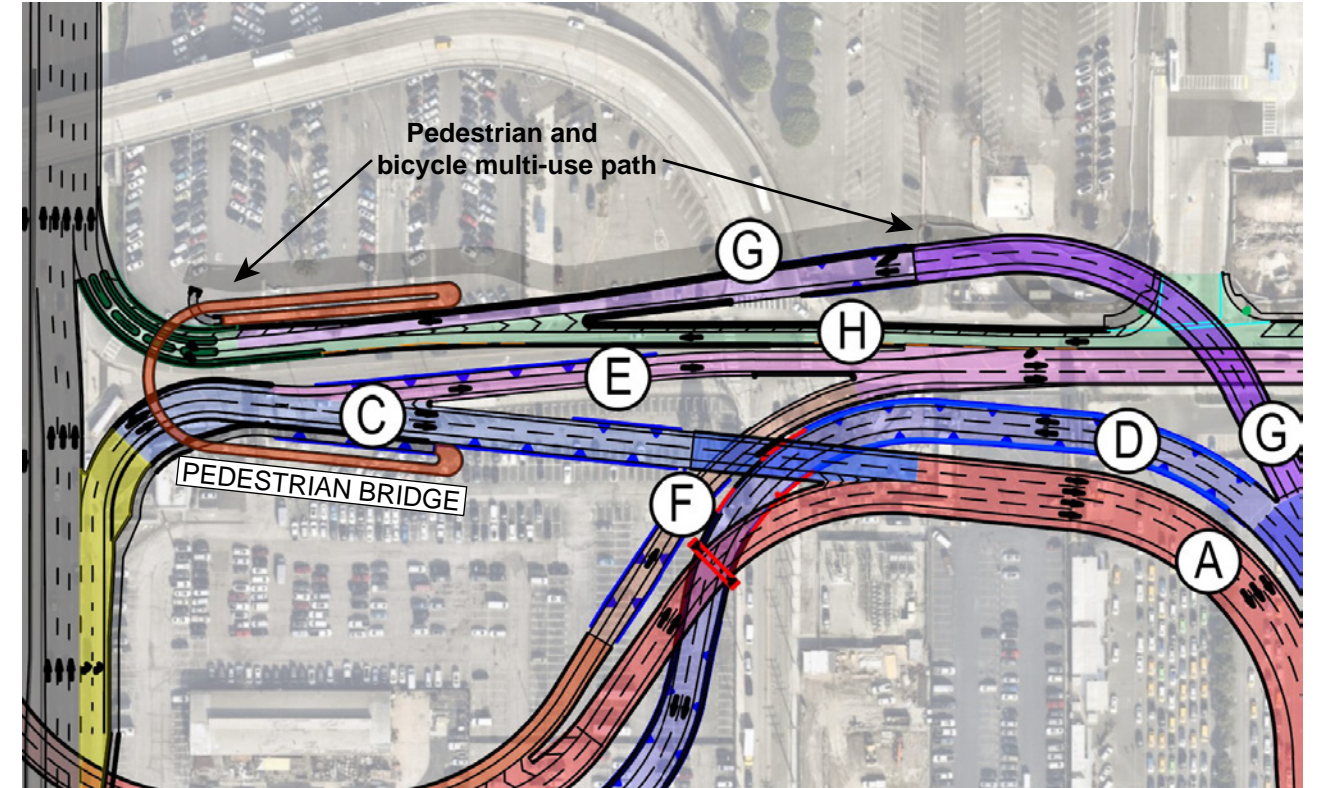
A pedestrian and bicycle multi-use path would be added along 96th Street westbound from Jetway Boulevard to Sepulveda Boulevard.
